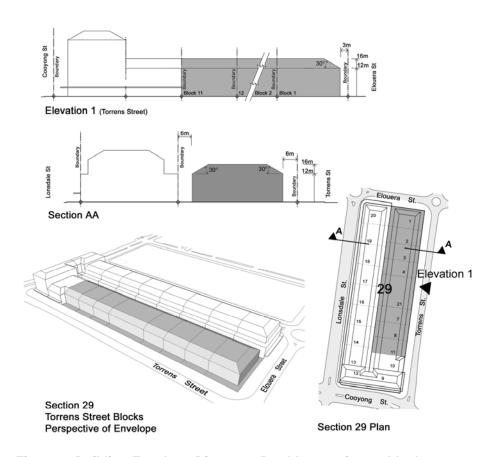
Building Envelope Diagram - Braddon section 29 blocks 1-4, 7,8, 10, 11 and 21
